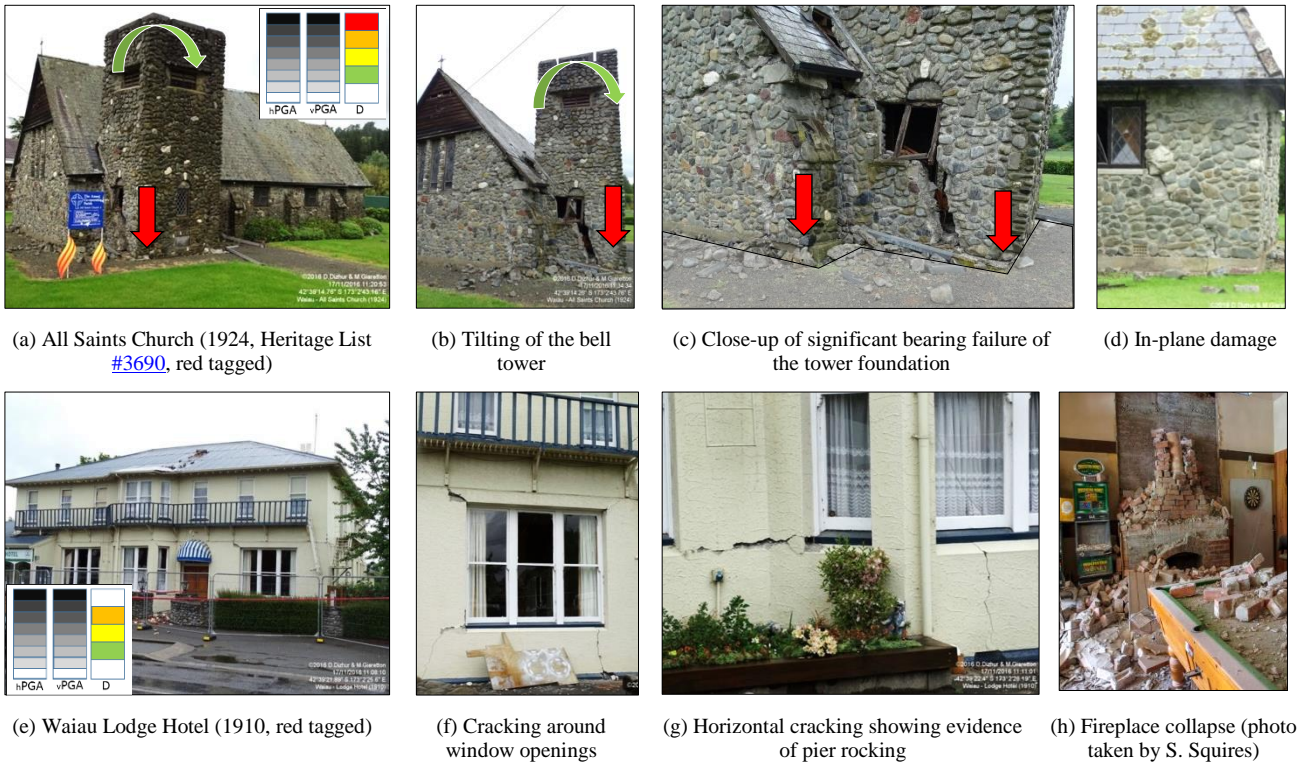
Vintage concrete buildings in Waiiau (hPGA 1.124g, vPGA 3.216g – WTMC).
